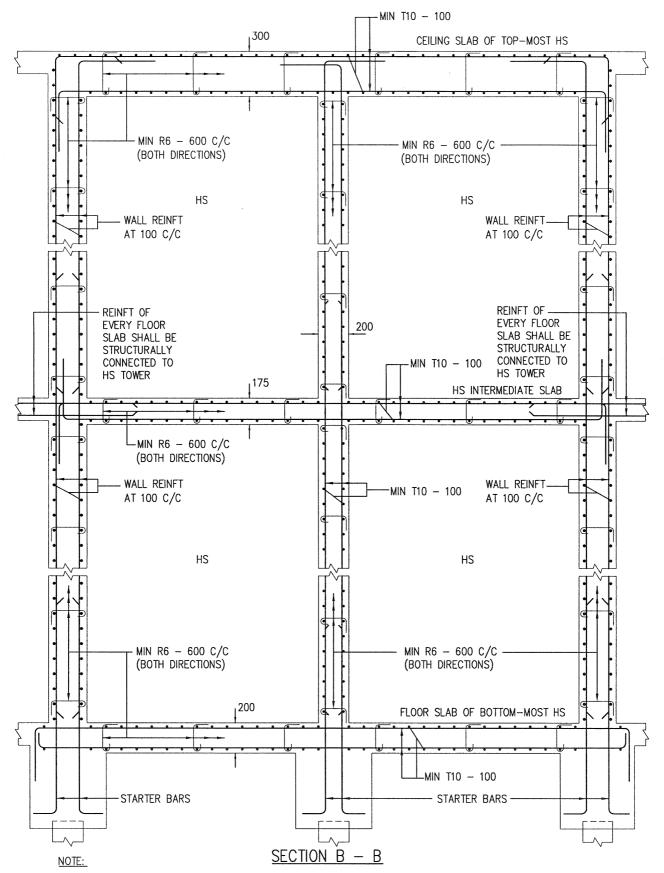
(b) TYPICAL DETAILS OF HS SLABS / WALLS
